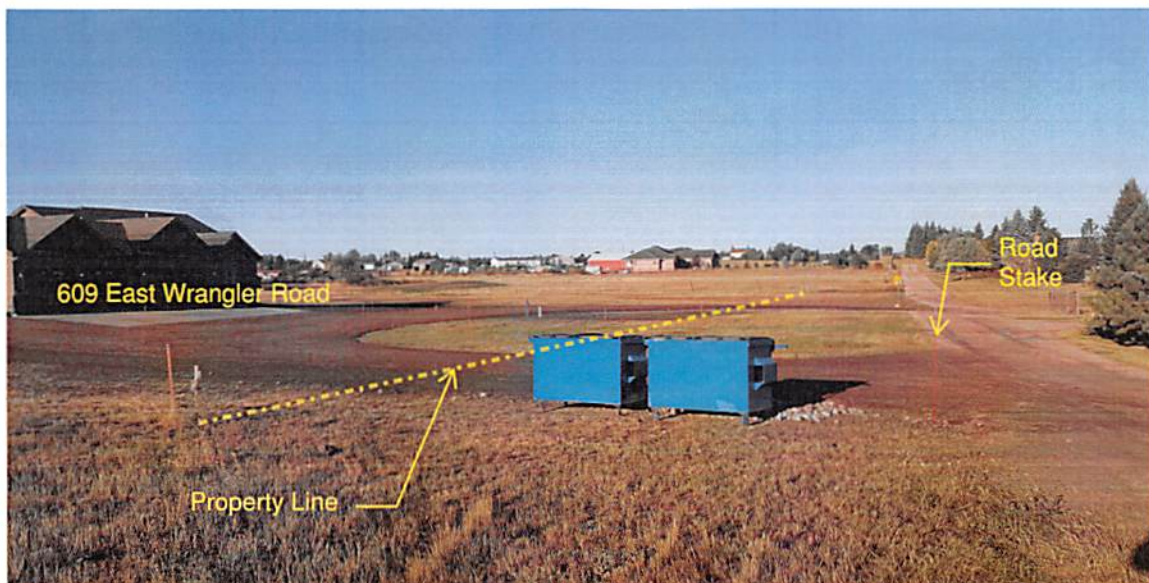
60' Right-Of-Way with obstructions restricting the travel width to 12 feet.
